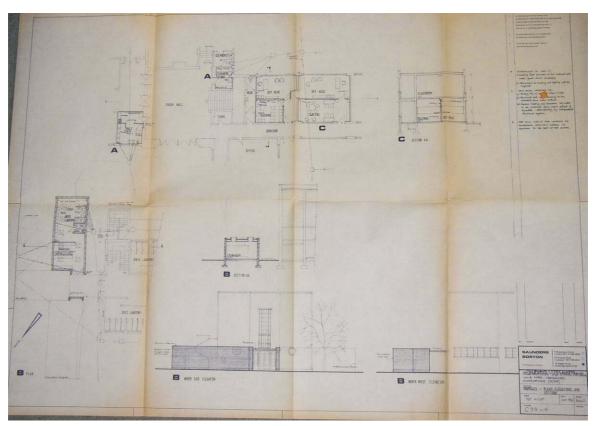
Proposed Alterations 1972, Showing Existing Elevation
